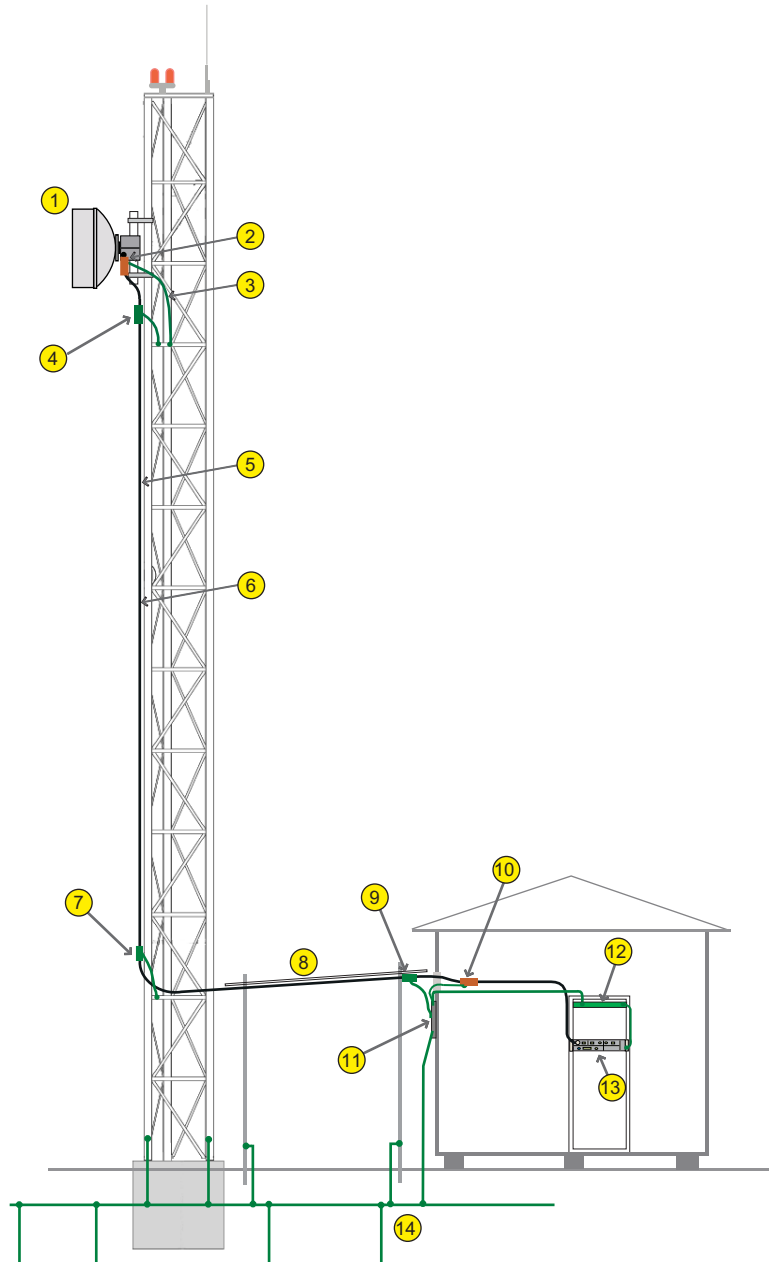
on page 2-23](#) shows typical tower locations for cable grounding and lightning surge suppressors. Note that an external suppressor is shown at the ODU end.
